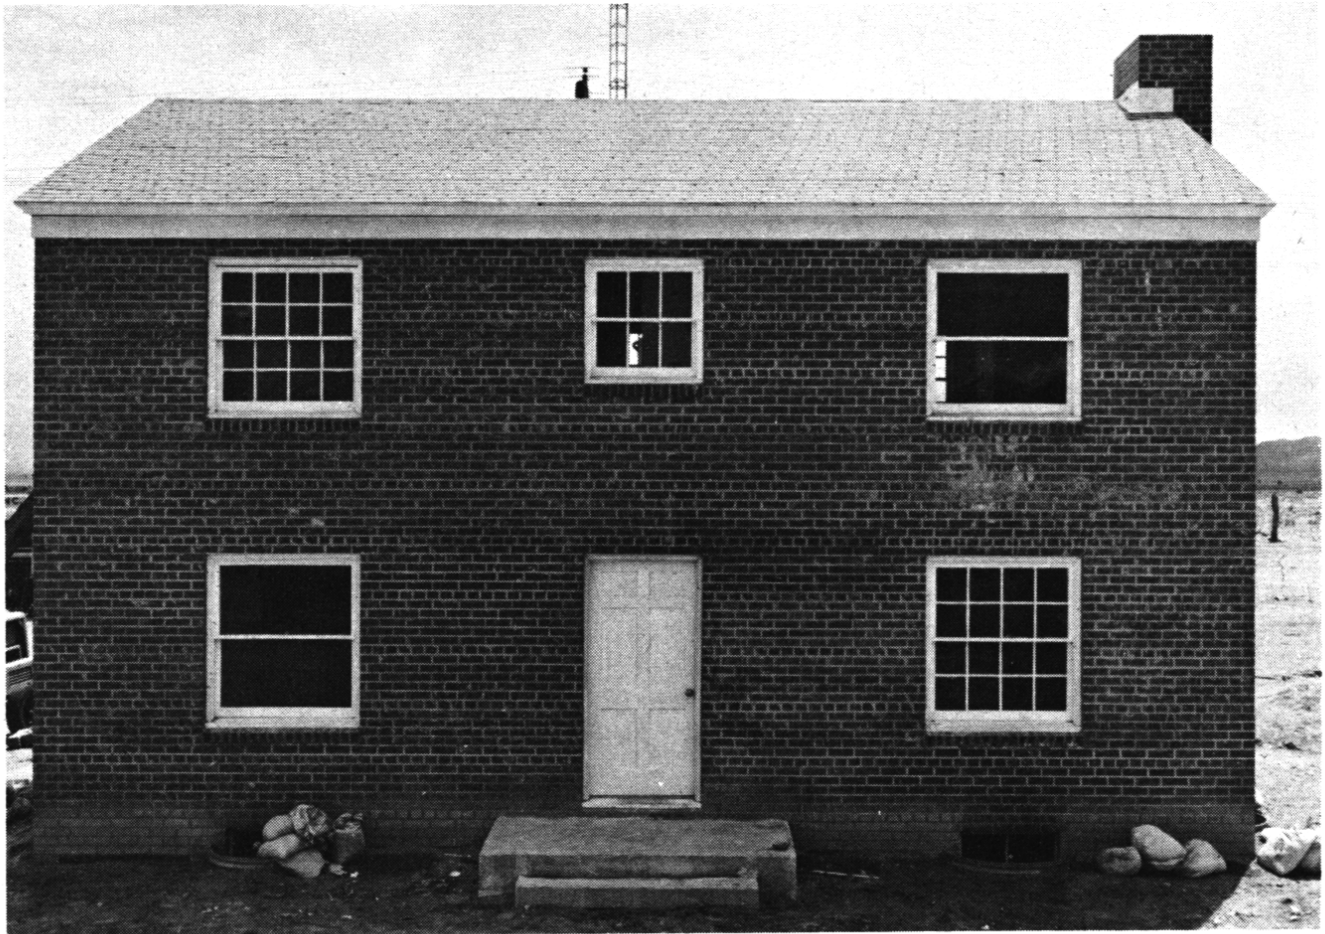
Unreinforced brick house before a nuclear explosion, Nevada Test Site.
